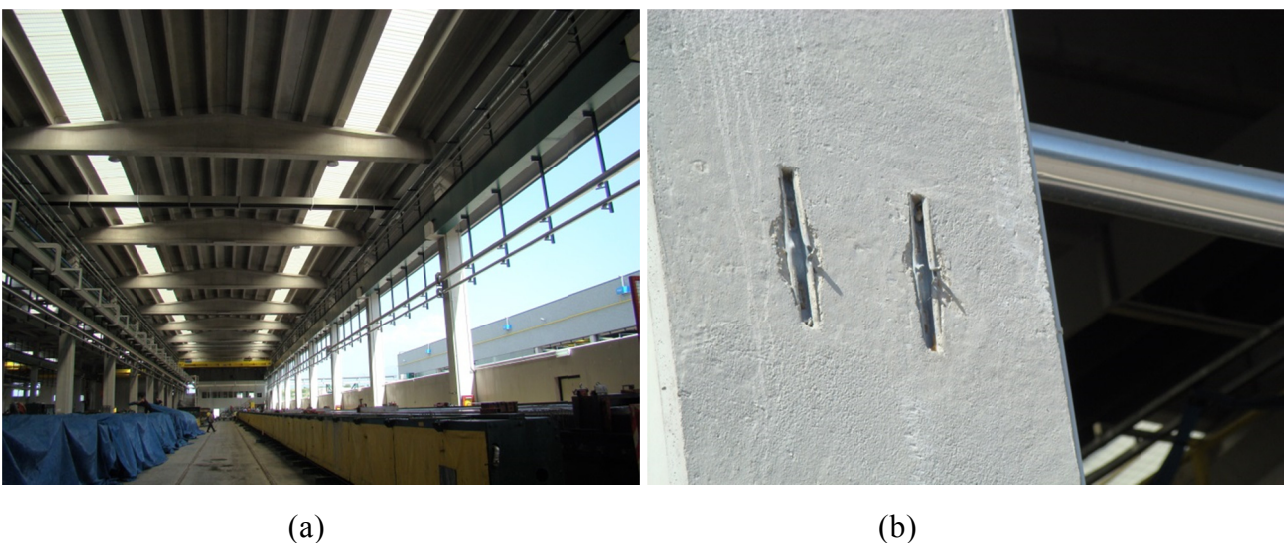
Cladding failure during L'Aquila earthquake: (a) view of the whole line of horizontal panels that collapsed, (b) particular view of the failed connections
